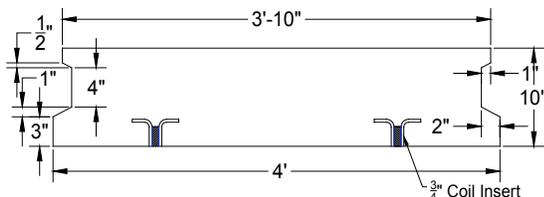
Cross Section of Sallow Flat Soffit Precast Floor Beam at A-A (ft = 0.3048 m)
